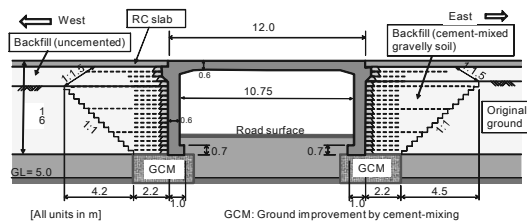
General structure (the width= 11.7 m) of the first prototype GRS integral bridge, for the new bullet train line at Kikonai, the south end of Hokkaido (by the courtesy of the Japan Railway Construction and Technology Agency), constructed in 2011 (Tatsuoka et al., 2012)
